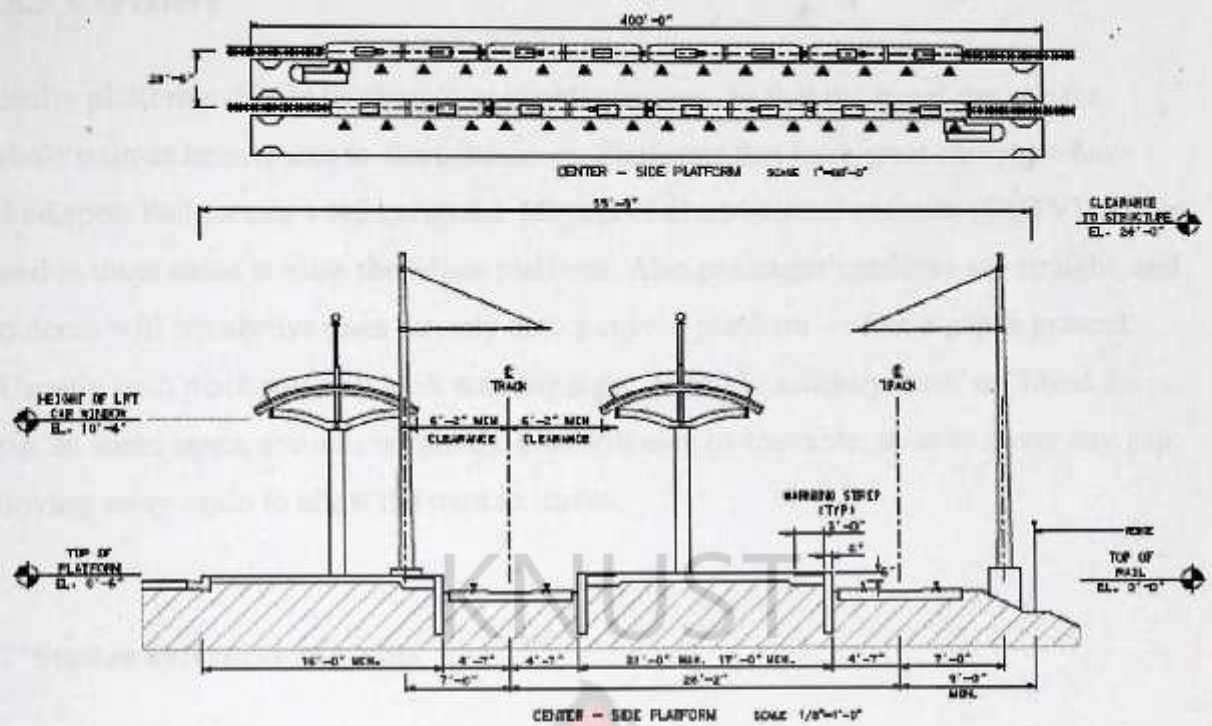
Typical section through a center platform (Source: Terminal Architecture and Engineering)
